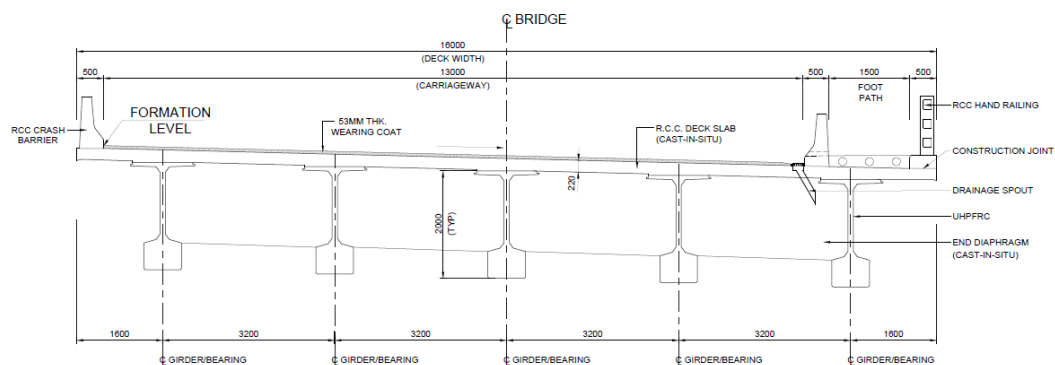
38 Cross section of 45m span UHPFRC post tensioned I girder at support
